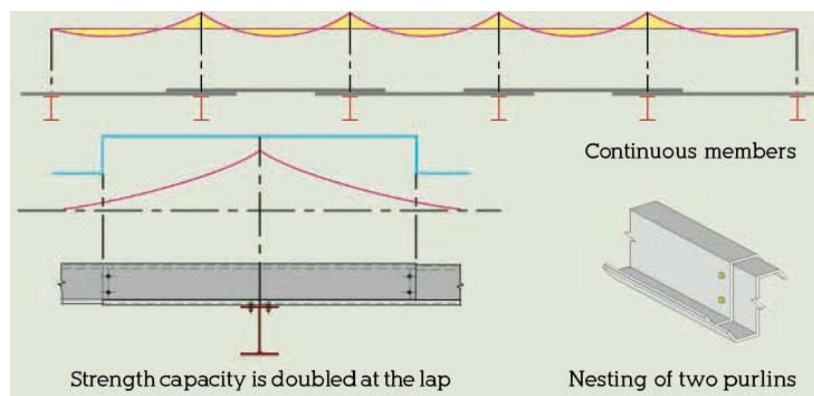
Image courtesy: (Mr. Roshan S Satpute, et. al “Building Design Using Cold Formed Steel Section”)
